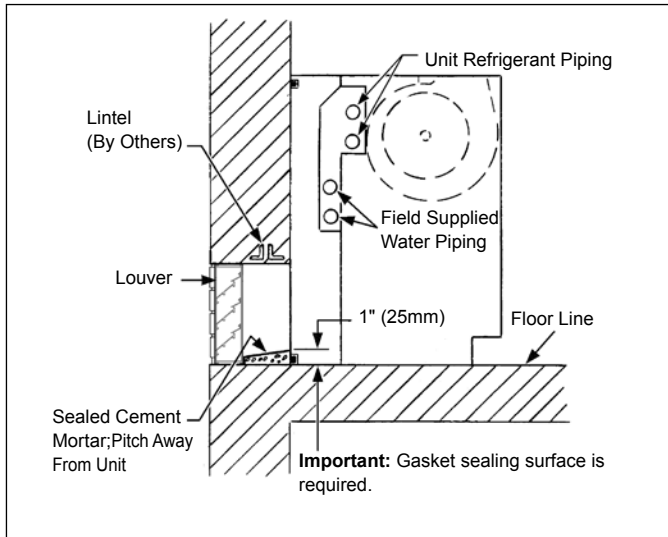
Floor level outdoor air intake with window below unit top and 9" "finished" (painted) accessory (insulated) closed refrigerant pipe chase
